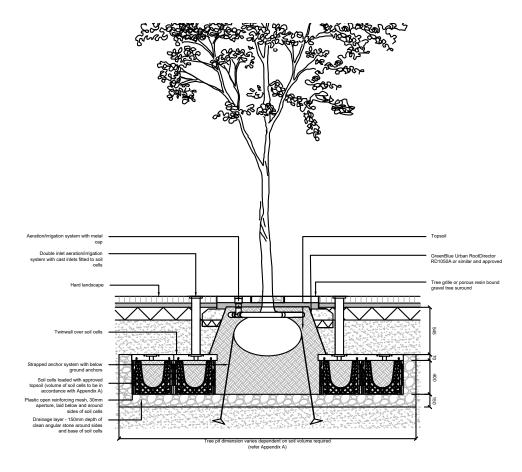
Typical detail of tree planting in areas of hard landscape
